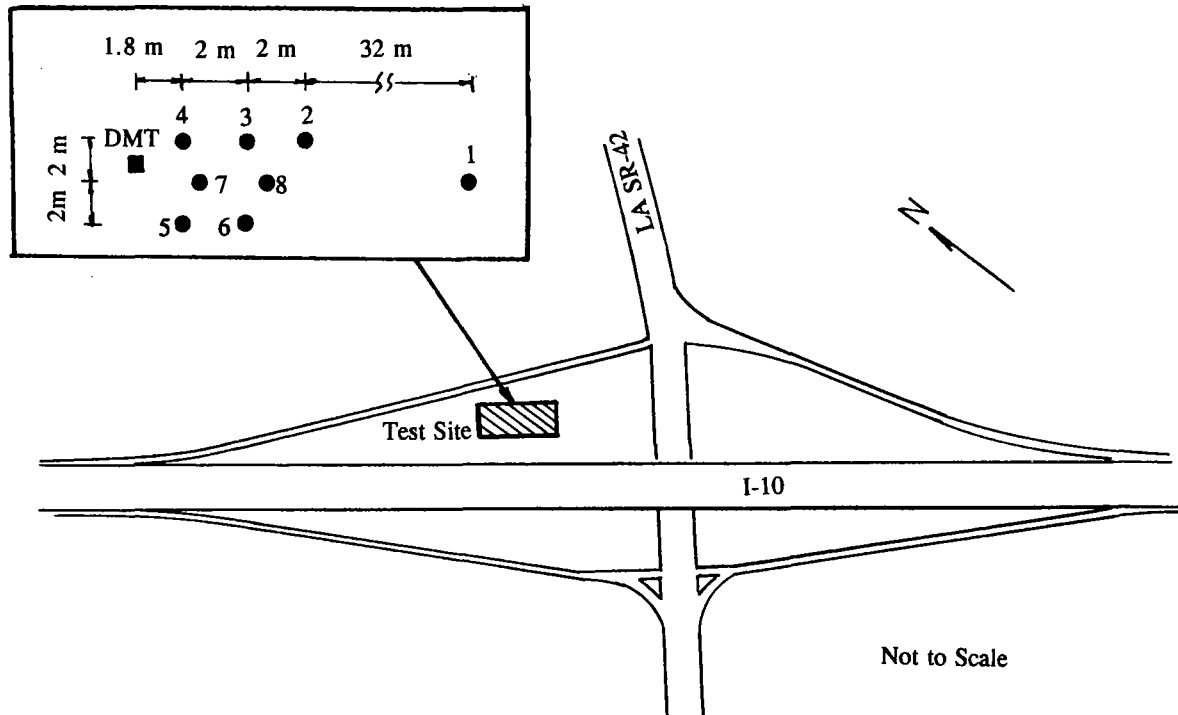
Site Plan and Field Test Locations at Baton Rouge Site, Louisiana.
